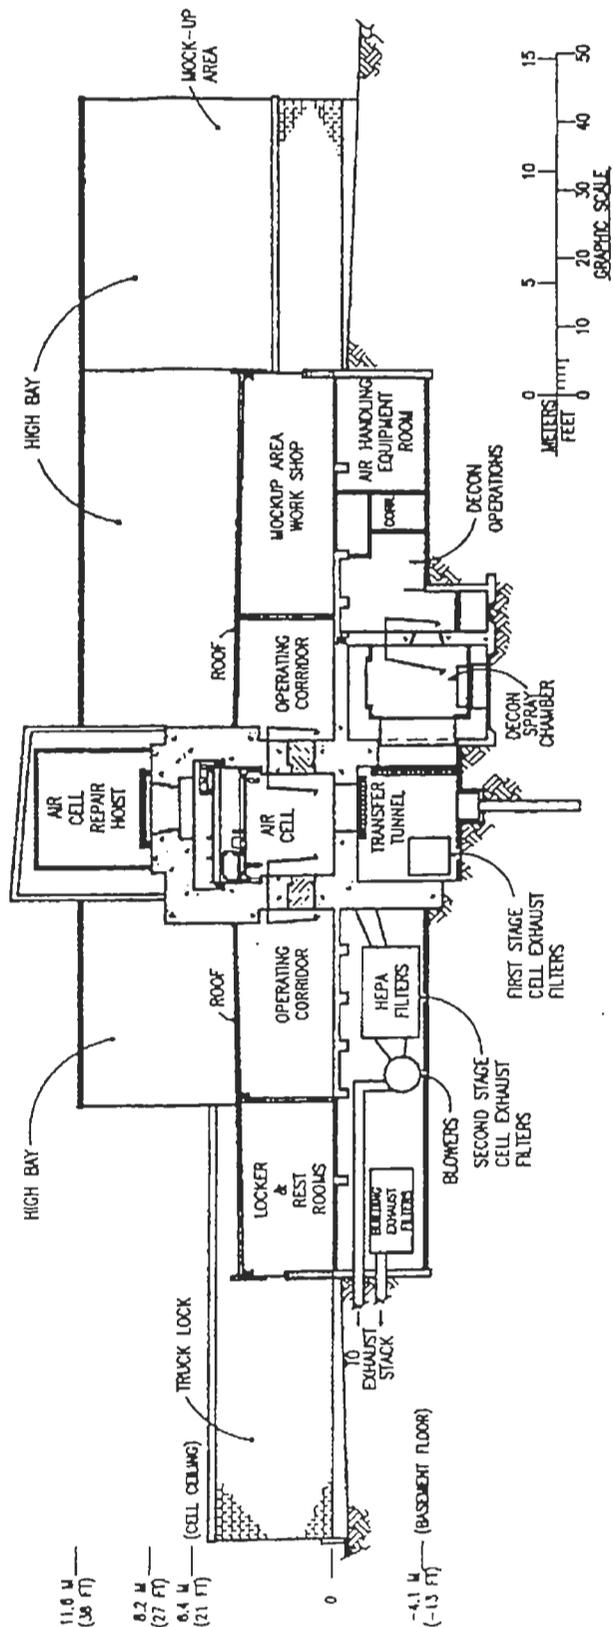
North-south elevation cross section of the FCF, at the location of the transfer tunnel.
